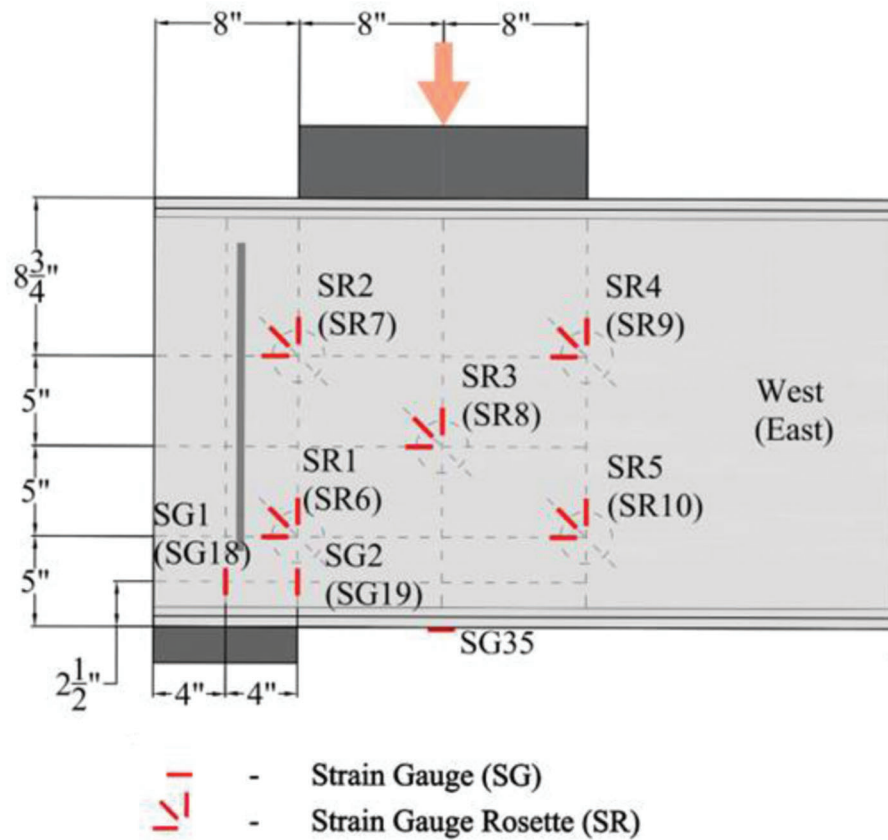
Strain gauge layout (side elevation): Specimen 1.
